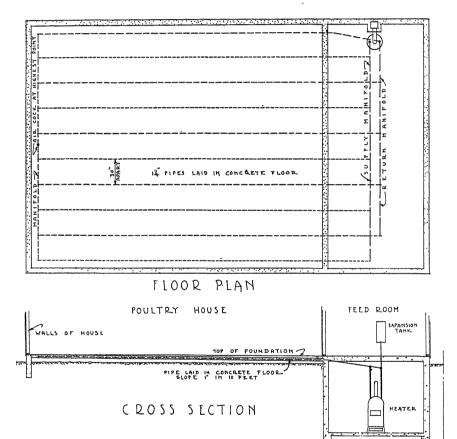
Poultry house with heated floor. The diagram shows how hot water pipes are placed the length of the house at 30-inch intervals. The floor is laid with 1-inch pitch to every 10-foot length to insure proper circulation of the water. The low end of the floor is at the heater.
